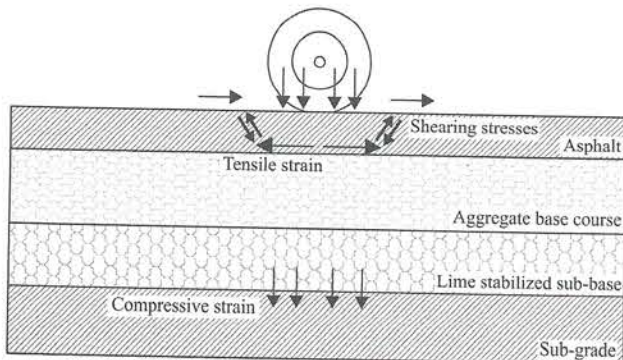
Critical stresses in a typical flexible pavement (Little, 1995).
